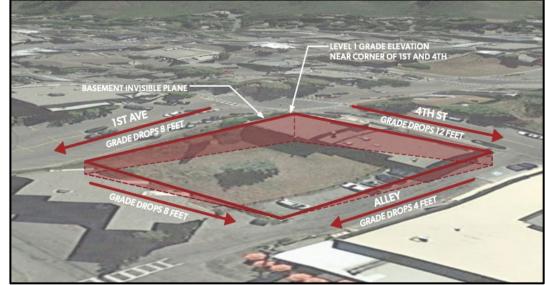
Site Slopes & Cross Slopes (Project Plans Page 43)
